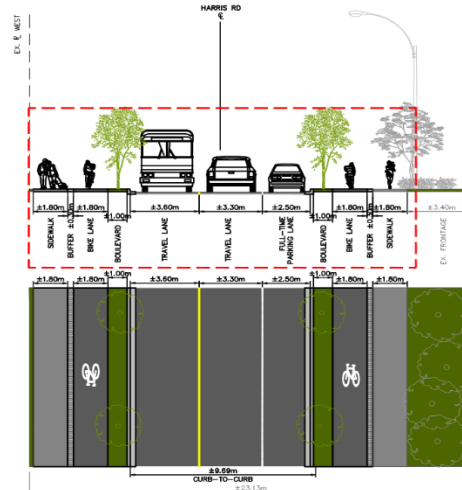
Segment 3: Option 2 Reconstruction Cross-Section
